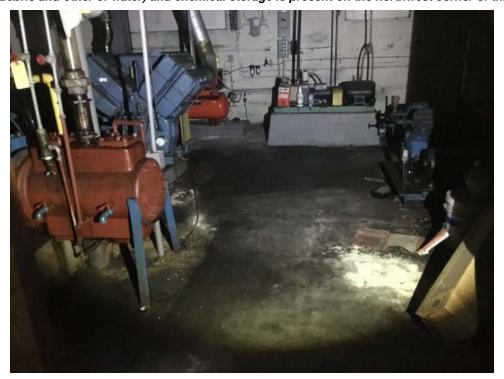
Oil absorbent located beneath a compressor adjacent to a floor drain in the southeast corner of the basement of the 550 Booth Street building. Other mechanical equipment is visible in this room.
